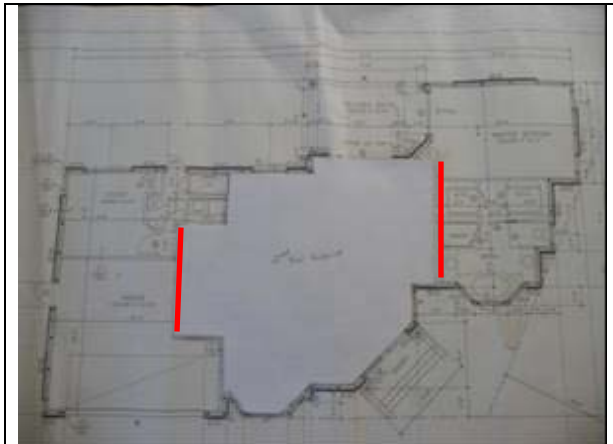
Floor plan of 2nd floor on top of 1st floor. Red lines show location of open floor cavity on east and west sides of House H23. Left side is to the east.
